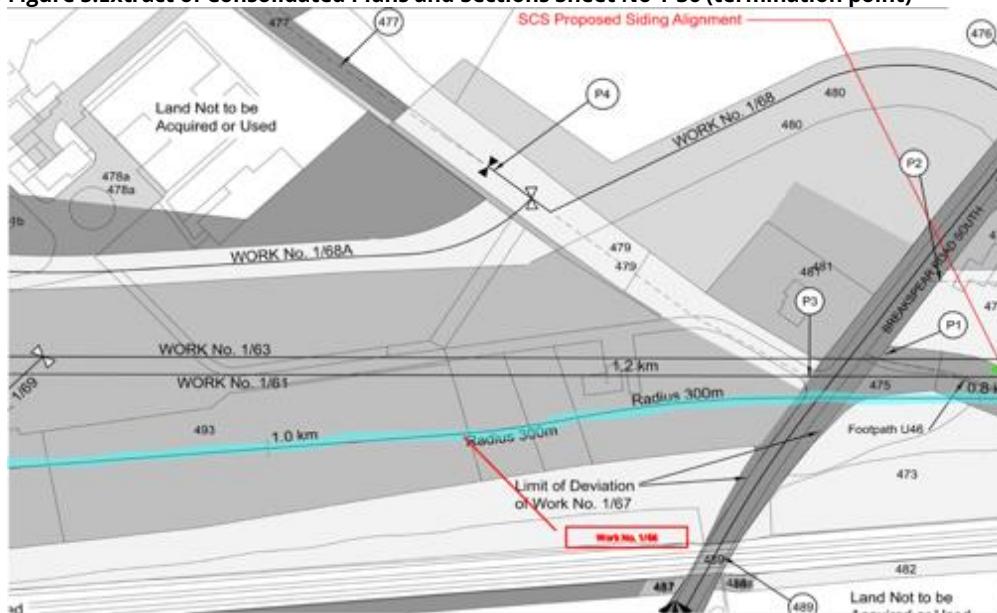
Extract of Consolidated Plans and Sections Sheet No 1-36 (termination point)
